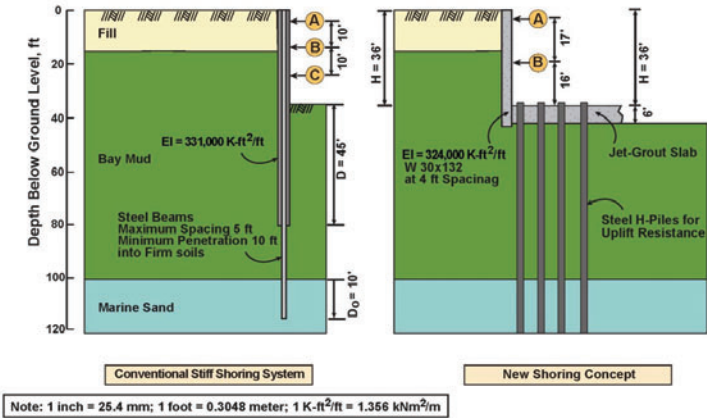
Islais Creek Contract D Excavations: Use of Soil Cement Walls and Jet Grouting Strut for Shoring
